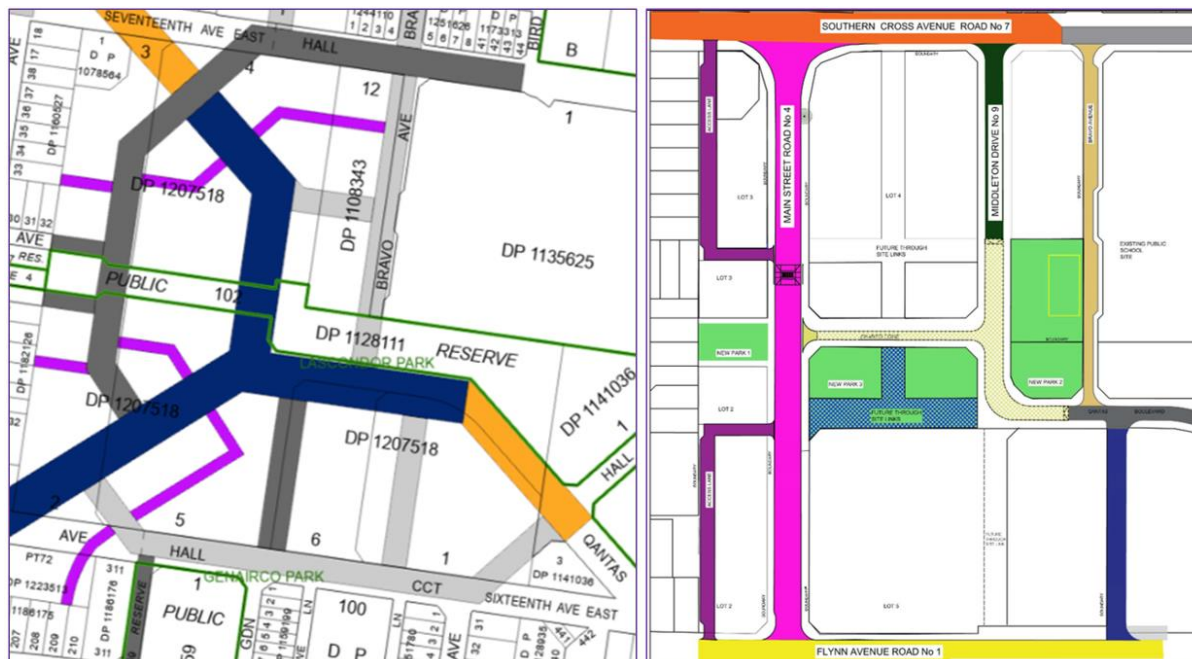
Current DCP Road Network (left) and Proposed Road Network (Right)
